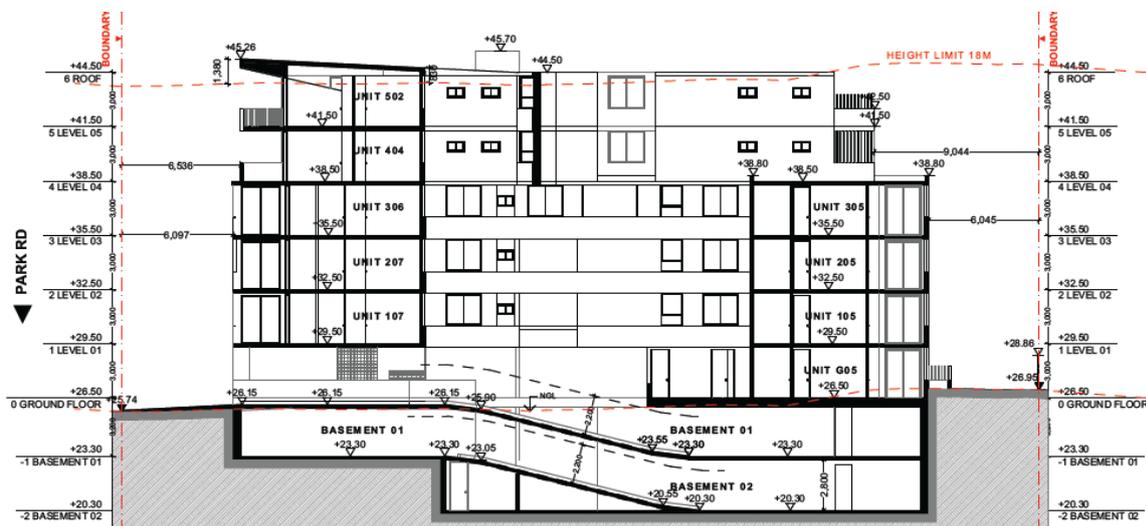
Section AA showing extent of Height Breach (Extract from Architectural Plan A1401 Sections AA)
